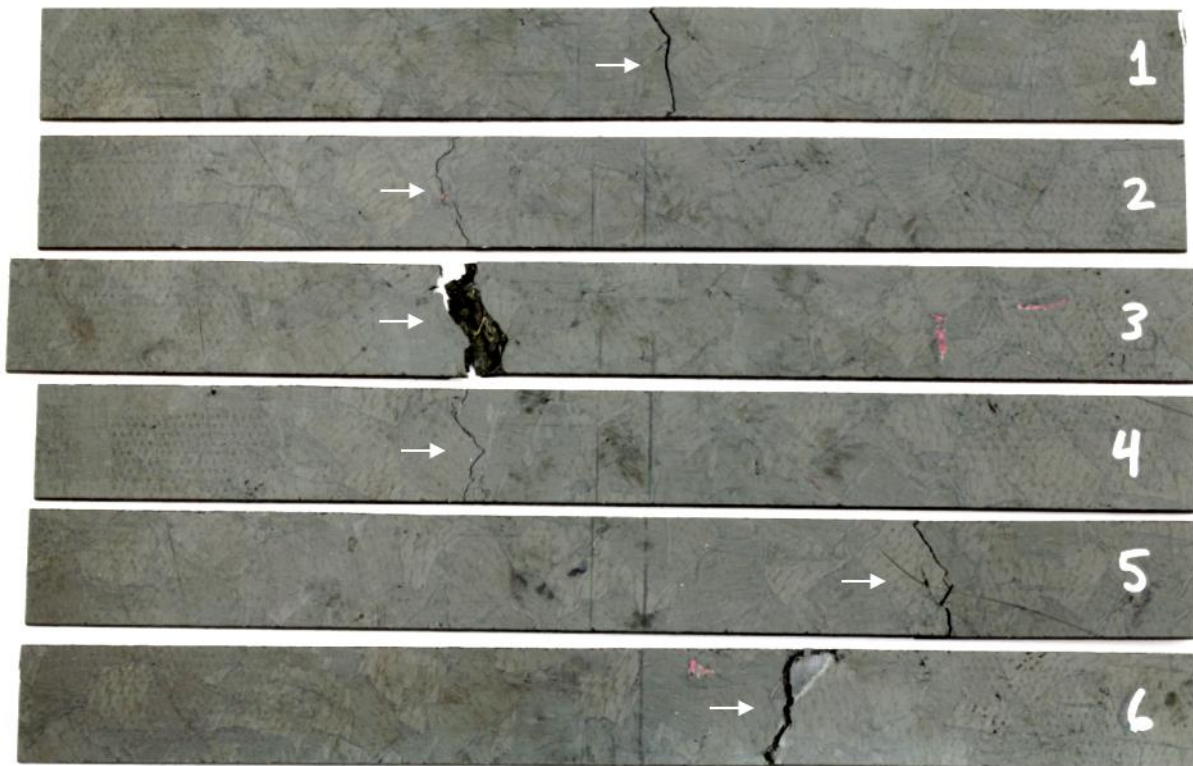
Picture of tested M26 specimens; white arrows indicate the location of failure.
